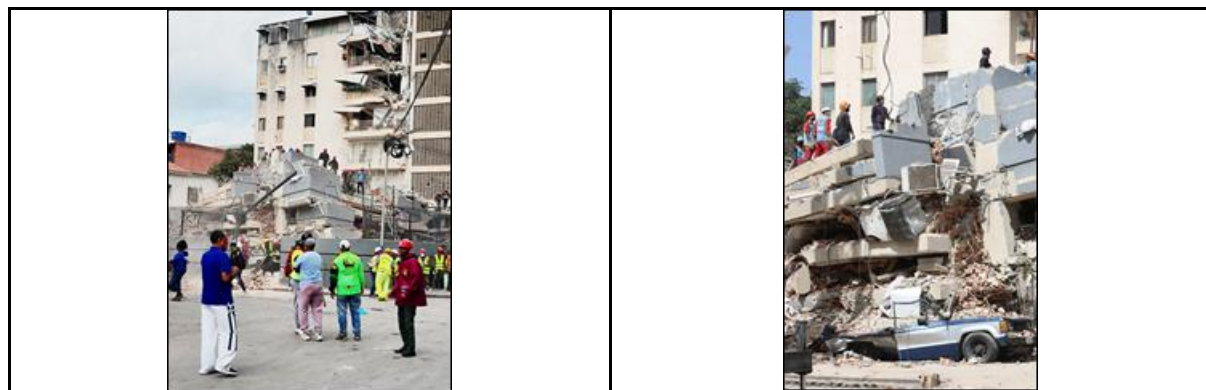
Edificio San Judas Tadeo - a collapsed 7-storey residential Reinforced Concrete (RC) building. The neighbouring building, originally a similar height, shows localised damage without collapse.
